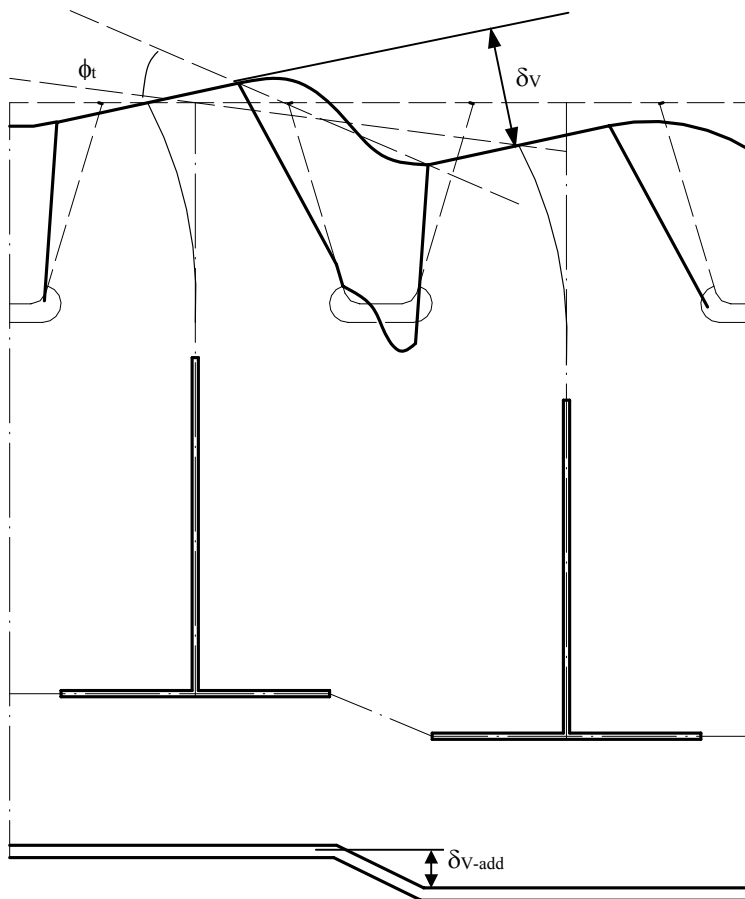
shows the deformations of the crossbeam, the deck plate and the trough bottom, caused by the shear transfer at the trough to crossbeam connection.
